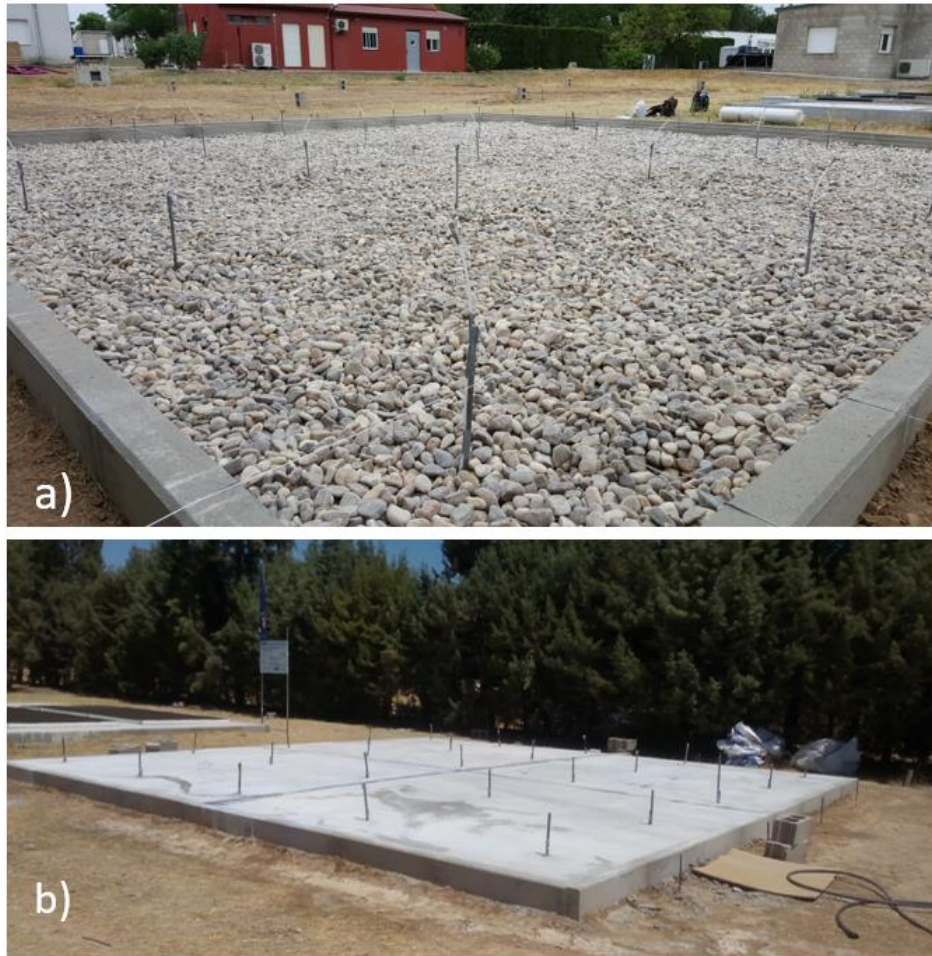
a) Slab construction: foundations and gravel fill; b) finished slab
